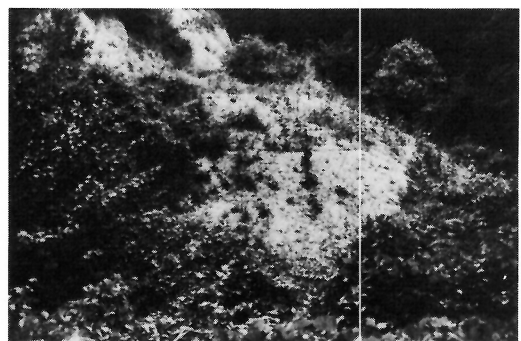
Experimental plot No.10 on banking slope of forest road construction in 1983 (Oct. 6, 1985)
